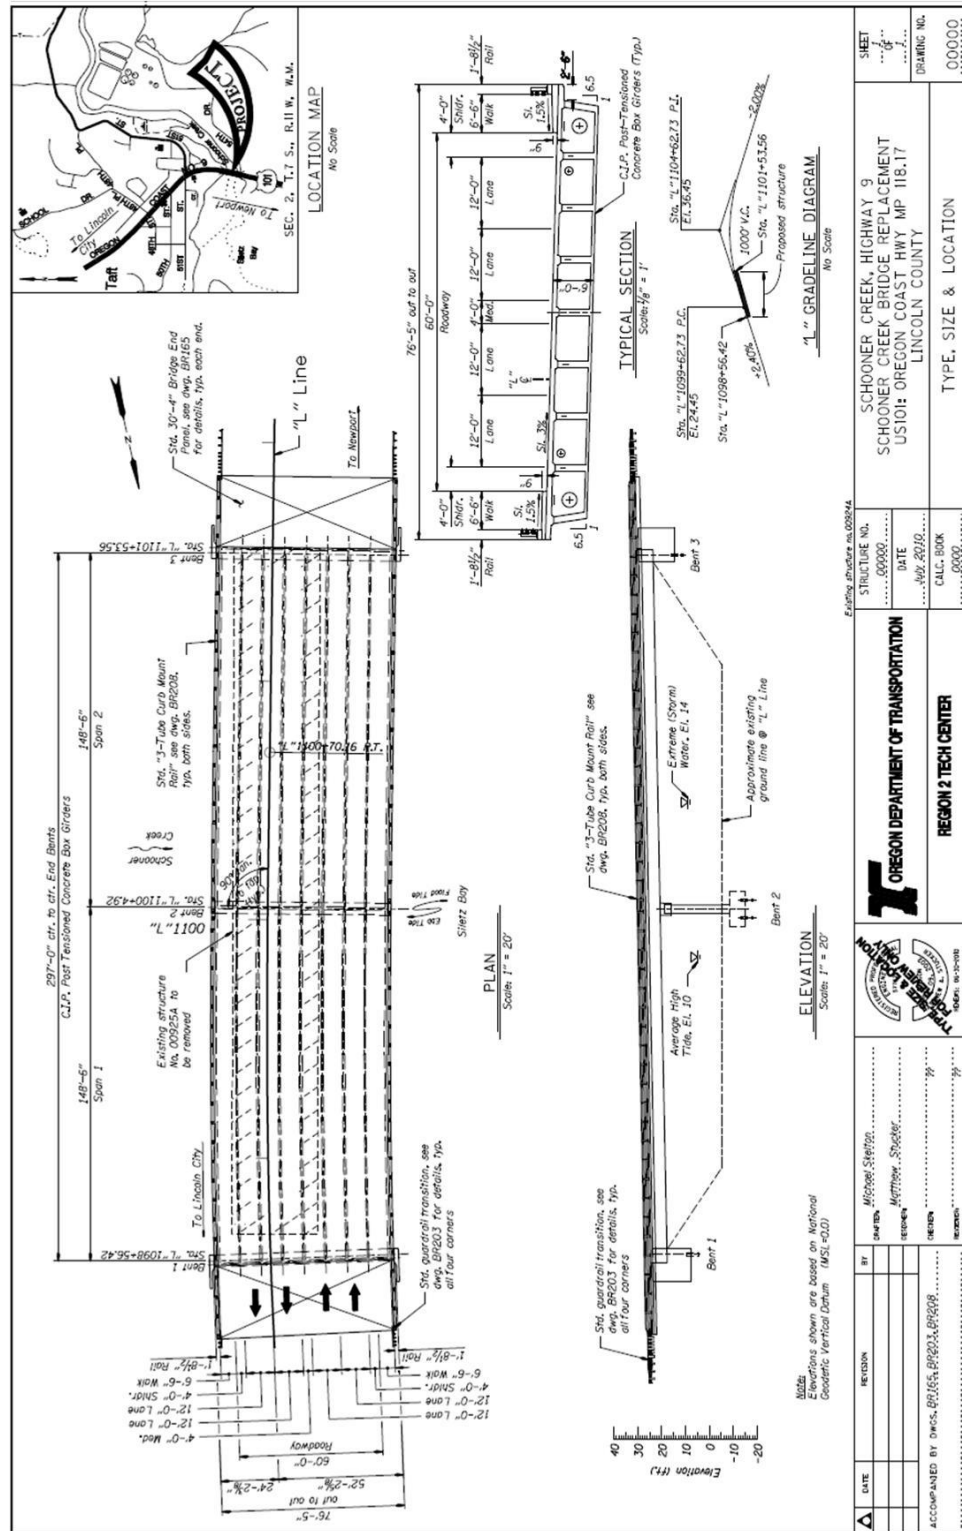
Preliminary drawing of Schooner Creek Bridge (box-section)
